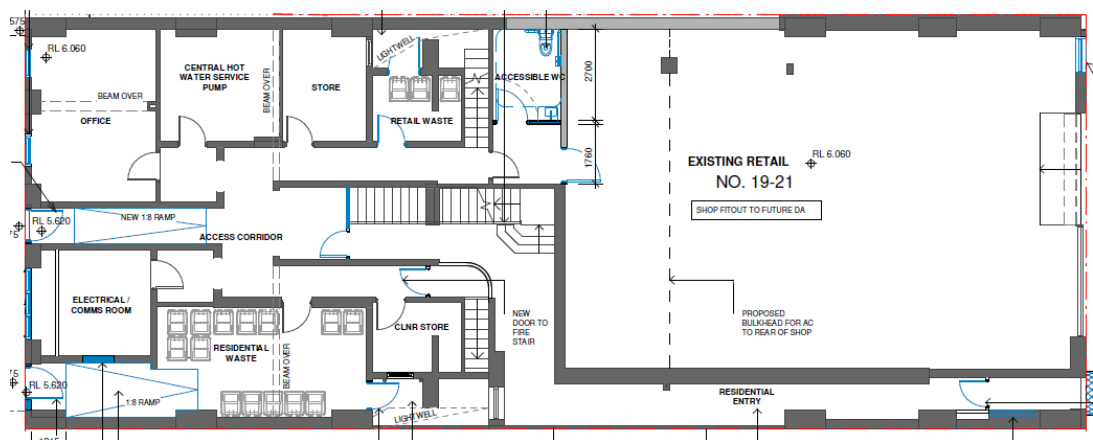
Proposed ground floor plan. (Source: NBRArchitecture)
